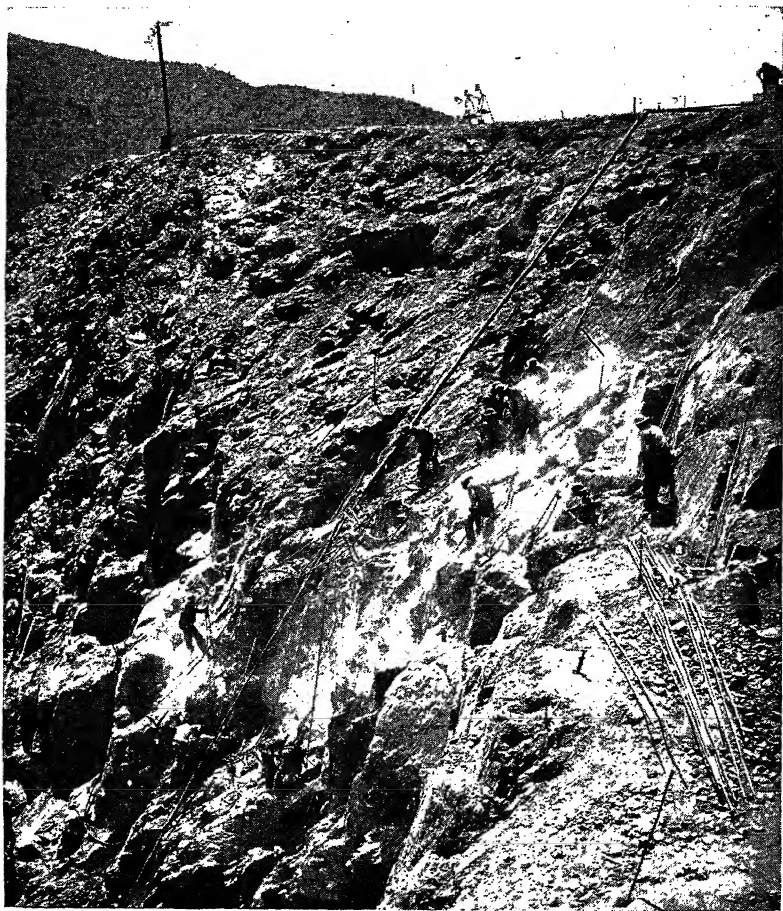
High scalers at work preparing abutments for Shasta Dam. (Courtesy of the Bureau of Reclamation, Department of Interior.)
